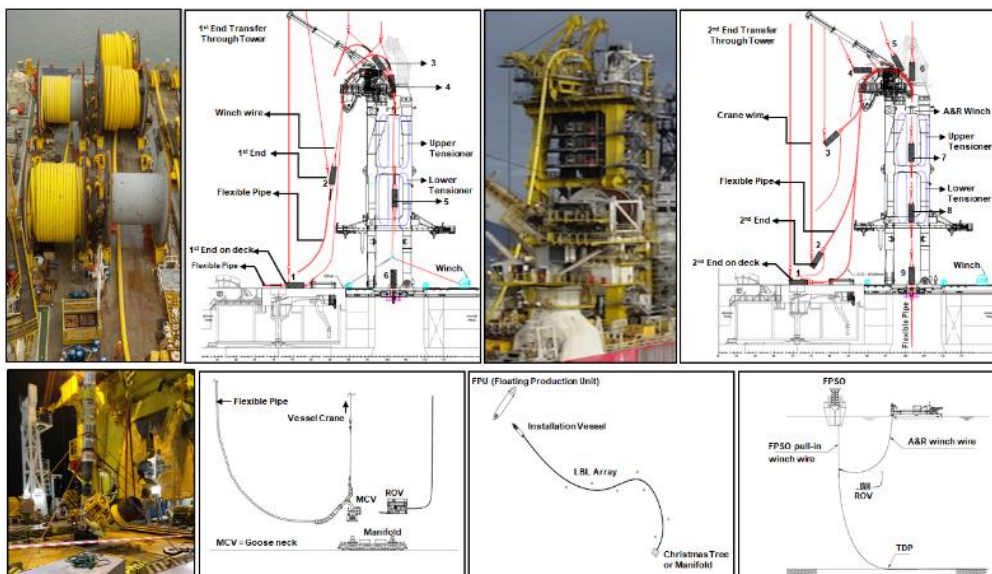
1st End and 2nd End End-fitting Transfer and Subsea Equipment Connected
